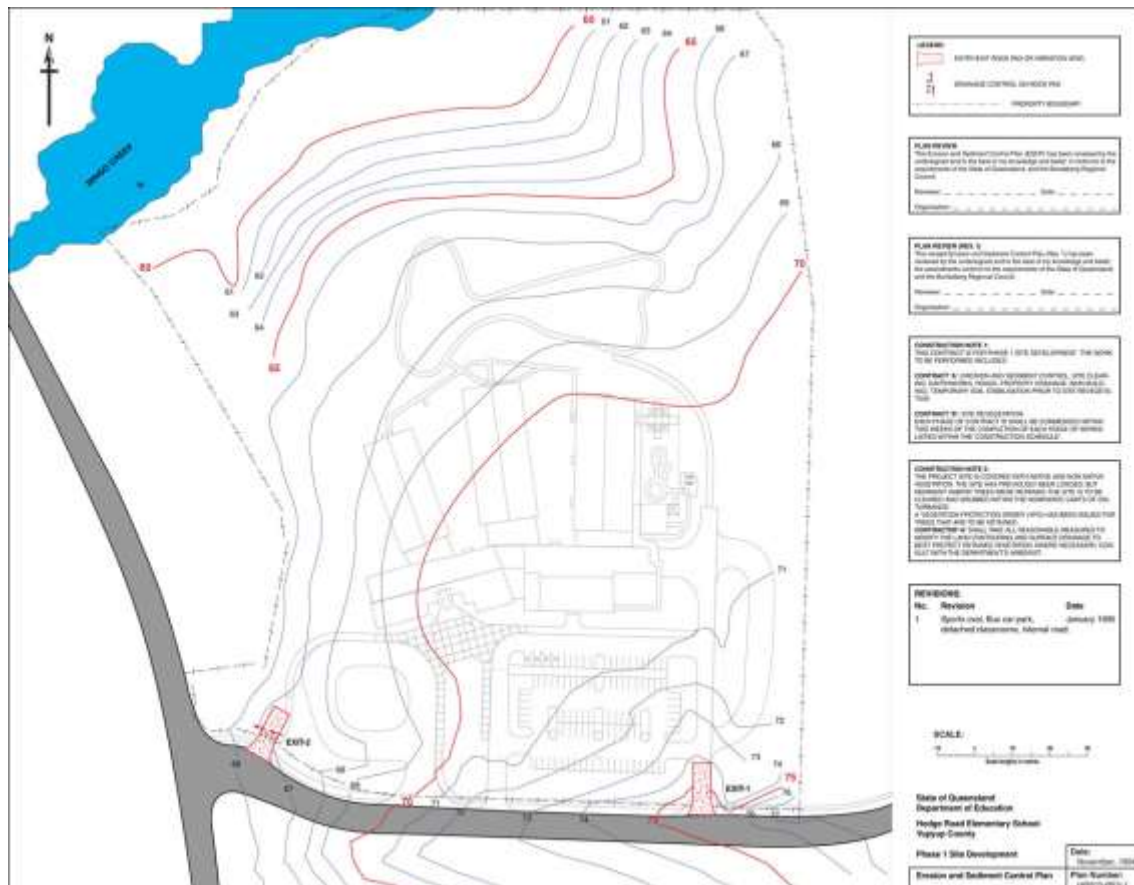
Stabilised site entry/exit points for the Hodge Road school site
